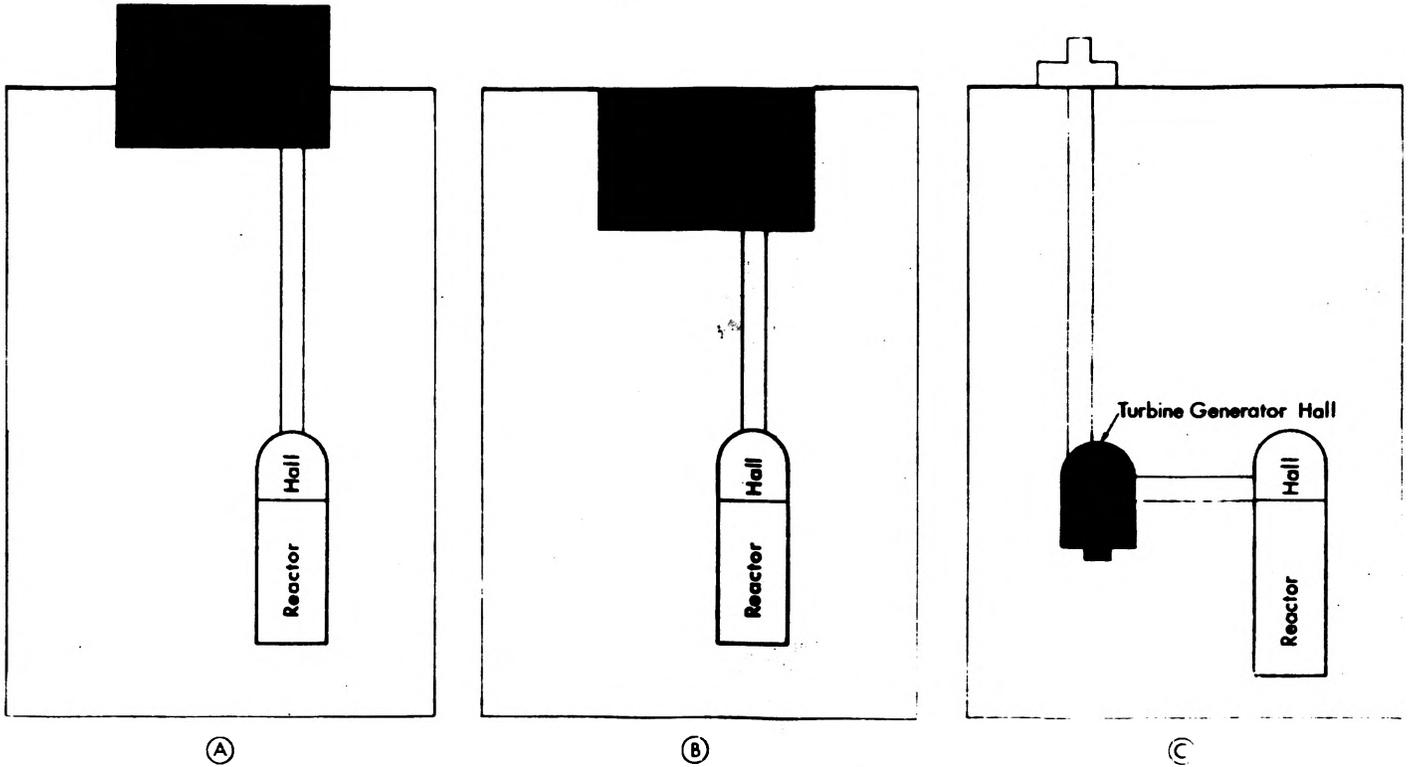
SCHEMATIC ARRANGEMENT-UNDERGROUND FACILITIES
